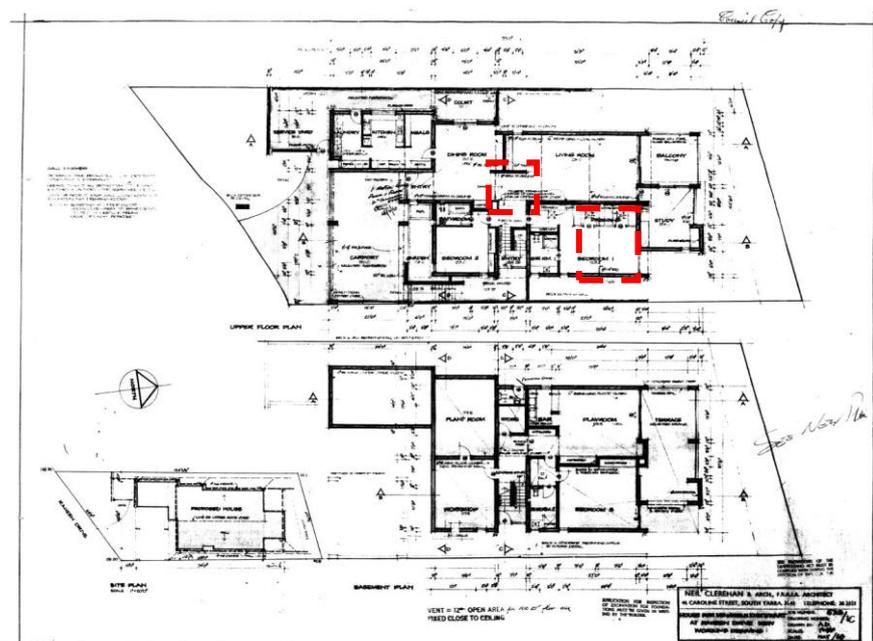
Site and Floor Plans of the subject site. Note the two entrances to the residence highlighted in red. Dated May 1968. (Source: Building Permit 778, for 13 Raheen Drive, City of Boroondara).
